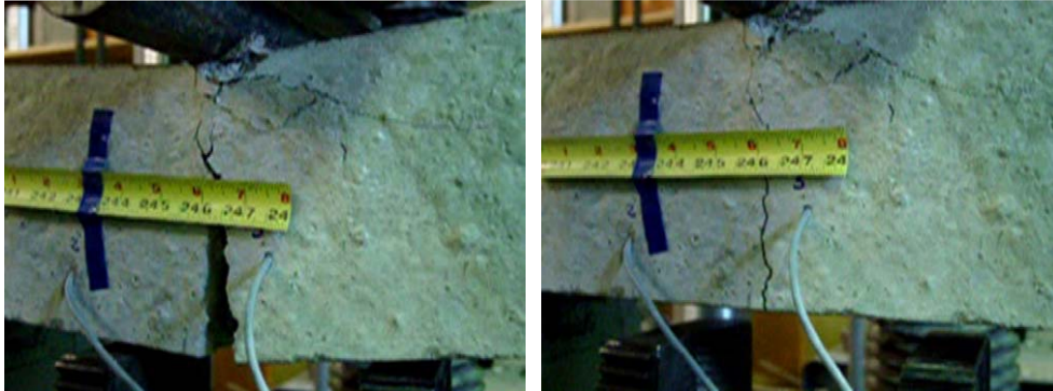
Elastic restoration of concrete beam: (a) cracking of the beam; and (b) restoration of the crack. [25].
